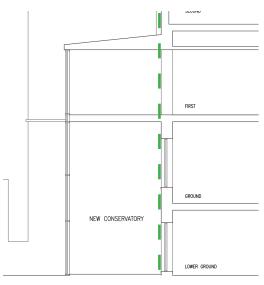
Showing section of consented scheme (ref: 12/01609/ FULL). Green dashed line denotes existing rear line of building at lower ground and ground floors for reference. Note the consented scheme demolished the existing first floor extension and extended out considerably further.
